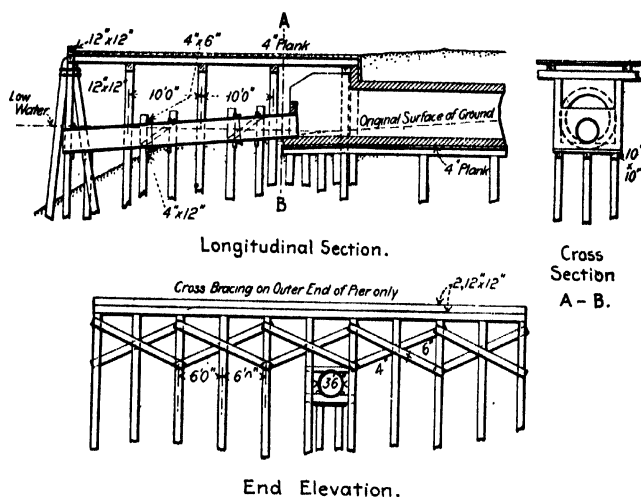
Outlet of joint trunk sewer, New Jersey.
